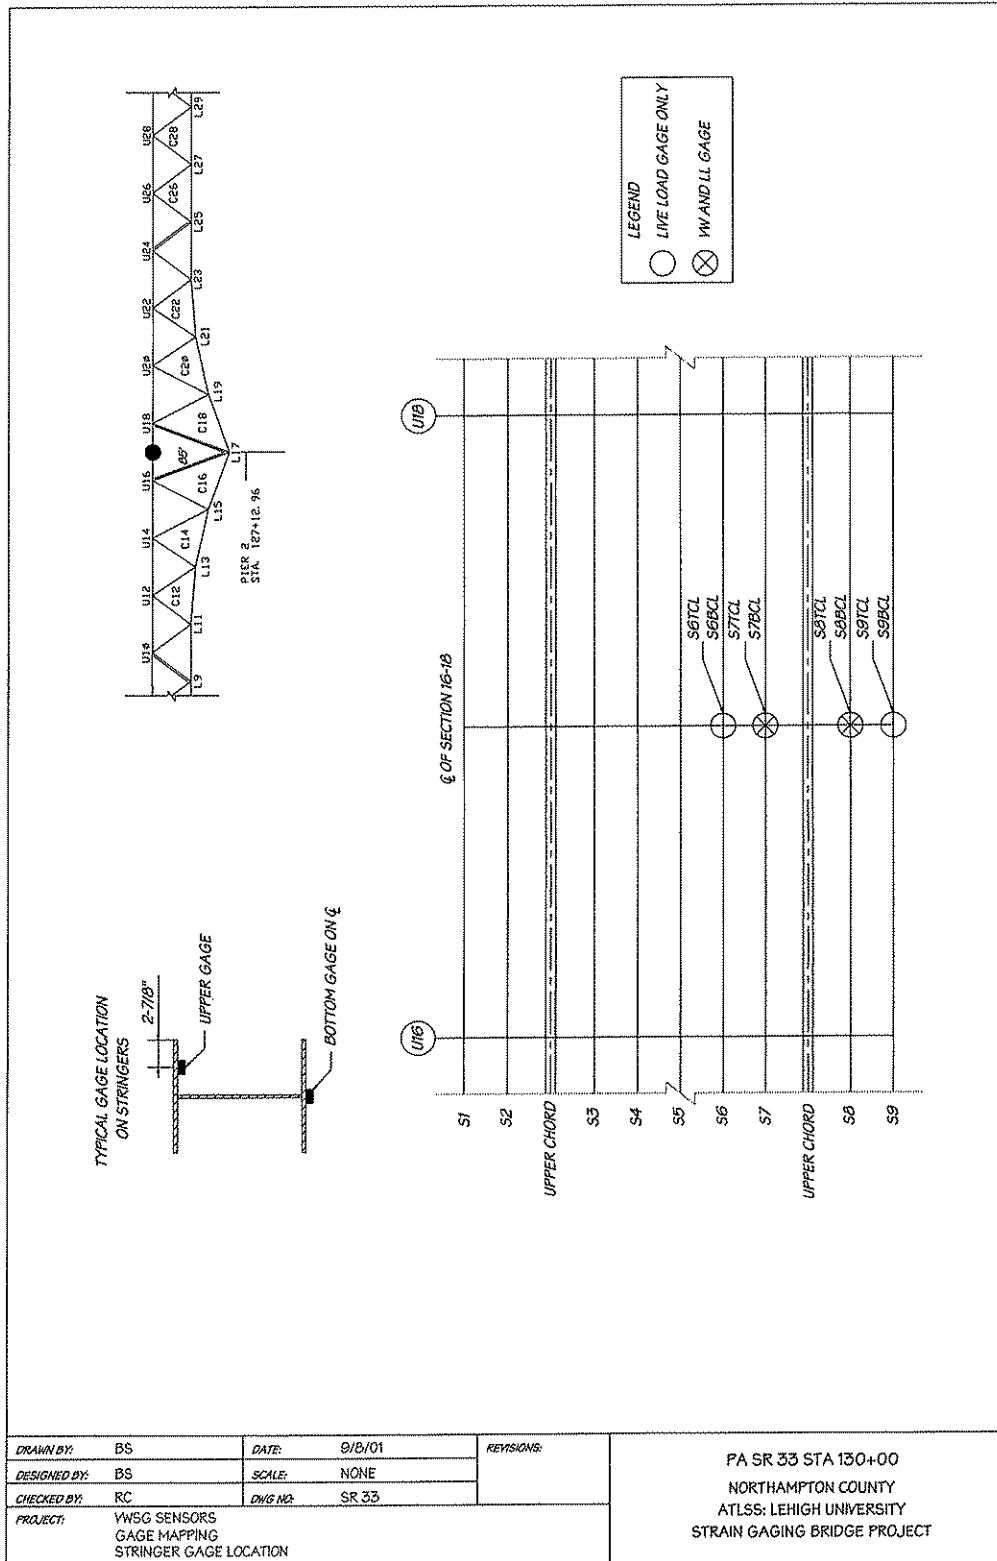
Strain gage layout on the stringers between U16 and U18.
